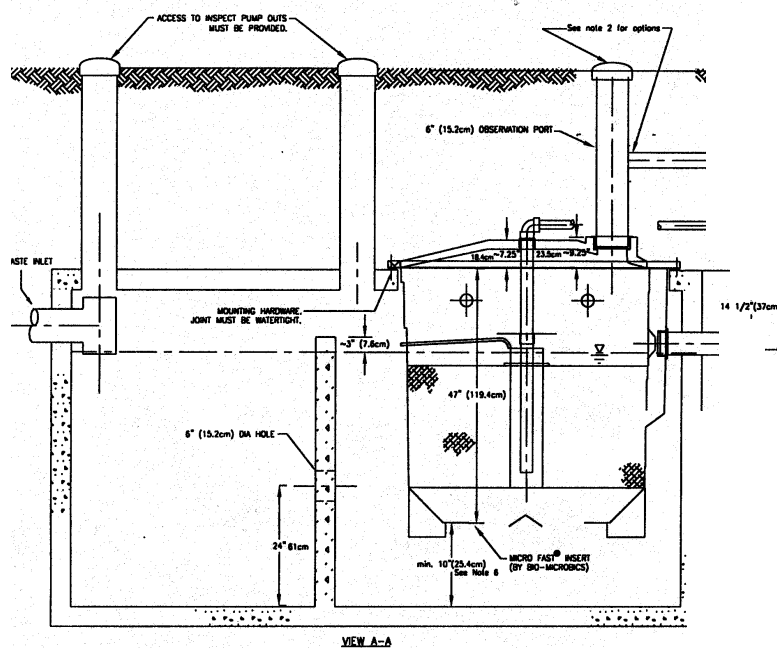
Side View of the FAST Onsite Wastewater Treatment System.
